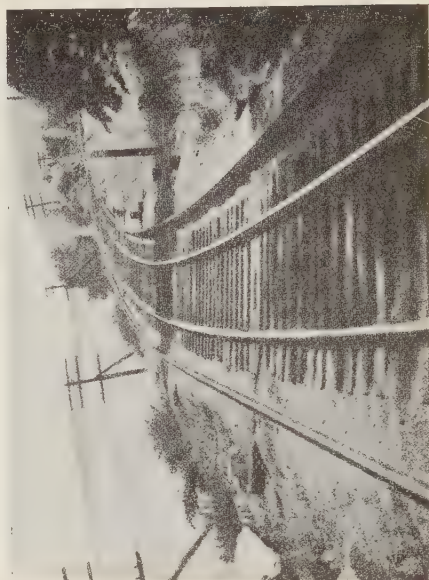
Welded rail-lengths alongsidetrack.
